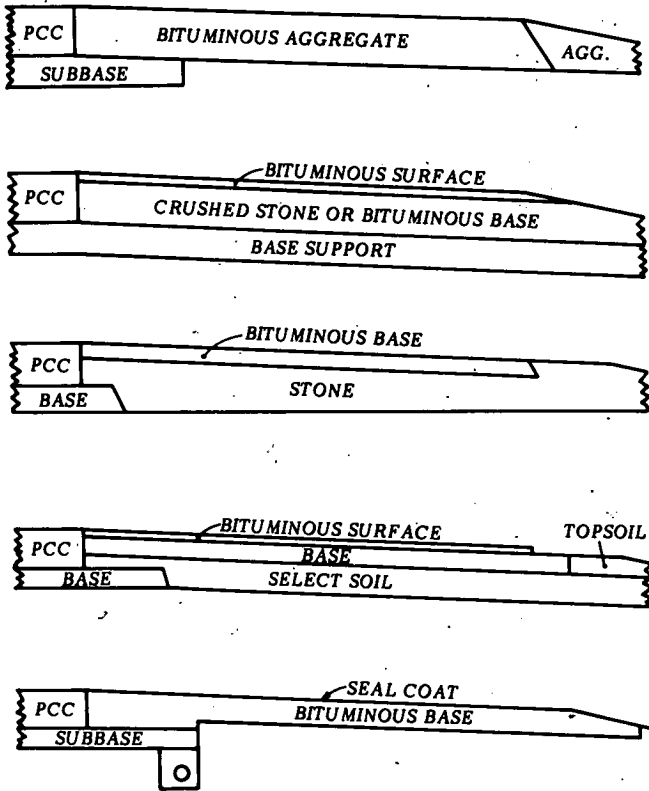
Typical bituminous shoulder designs adjacent to rigid pavements.
